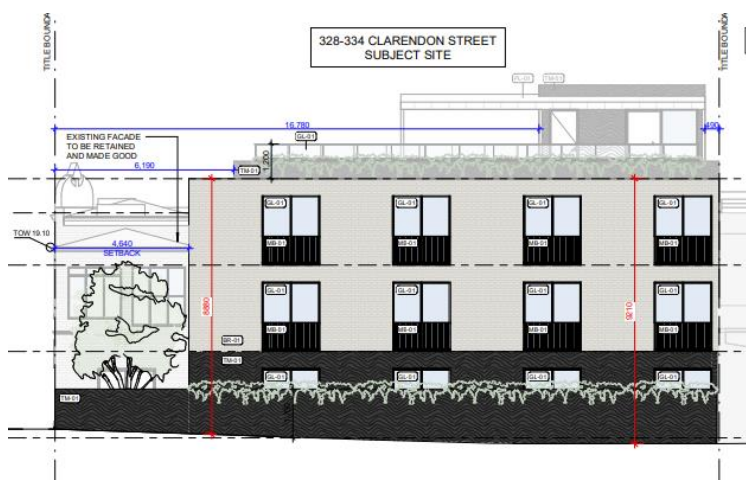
Proposed western façade of the subject site. Each of the new rear extension’s window is of a similar width as that of the heritage building. Source: Embrace Architects, 2026.
